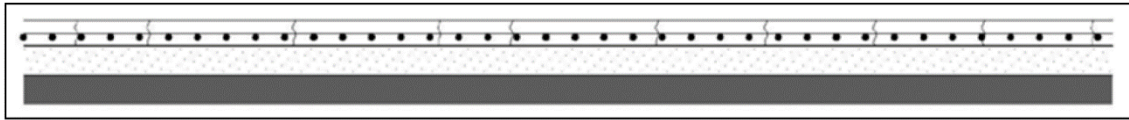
Ultra-Thin Reinforced Concrete (UTRC) pavement (Source: SAPEM, 2013d)
